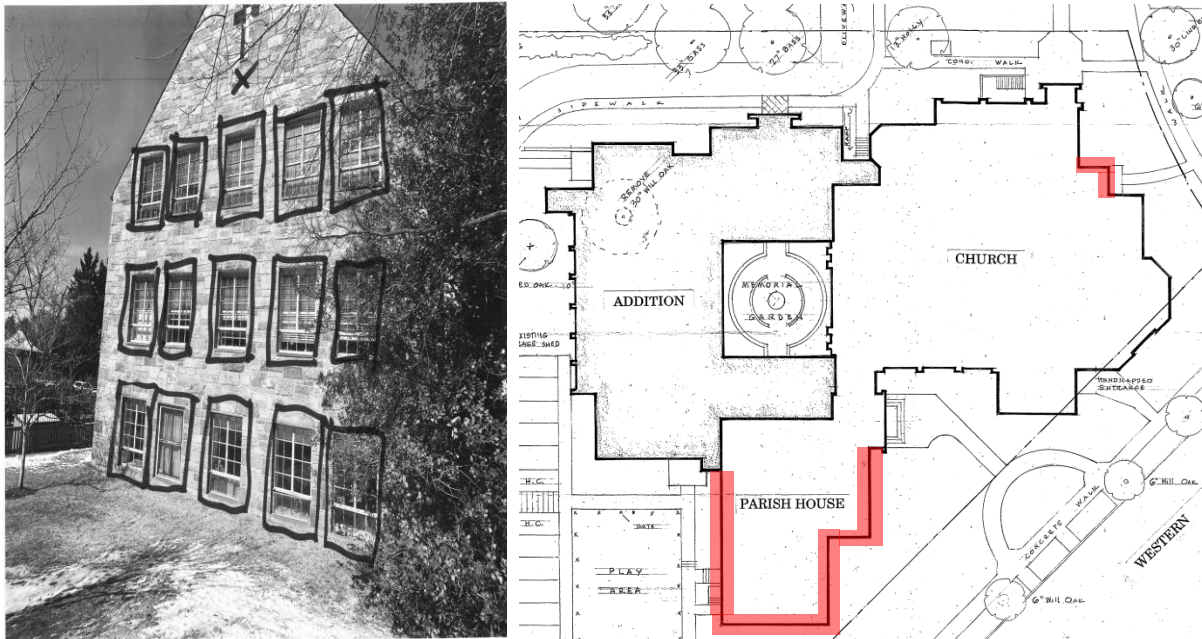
South elevation of the Parish house (left) and the plan showing the location of proposed windows highlighted in red (right).
